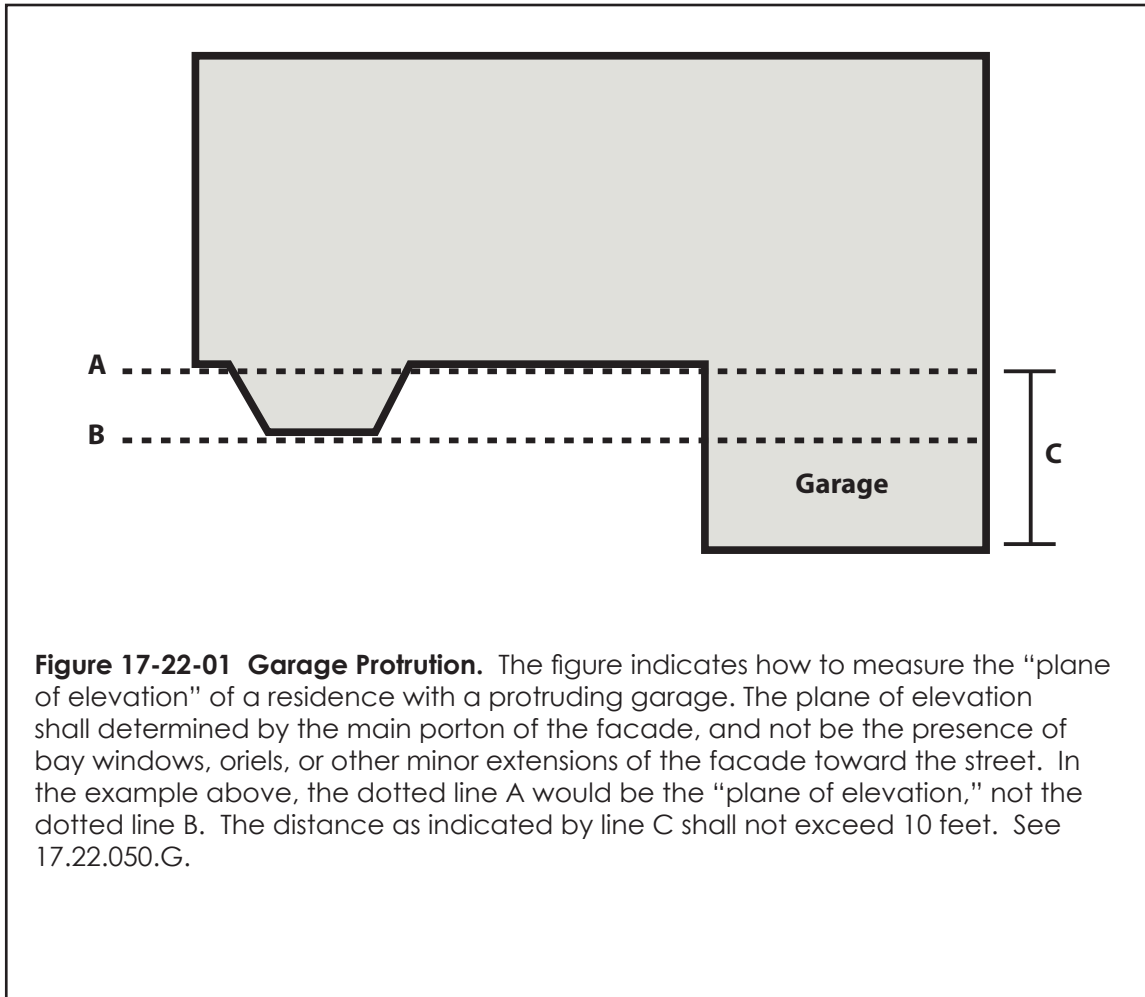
Garage Protrusion. The figure indicates how to measure the "plane of elevation" of a residence with a protruding garage. The plane of elevation shall be determined by the main portion of the facade, and not by the presence of bay windows, oriels, or other minor extensions of the facade toward the street. In the example above, the dotted line A would be the "plane of elevation," not the dotted line B. The distance as indicated by line C shall not exceed 10 feet. See 17.22.050.G.
